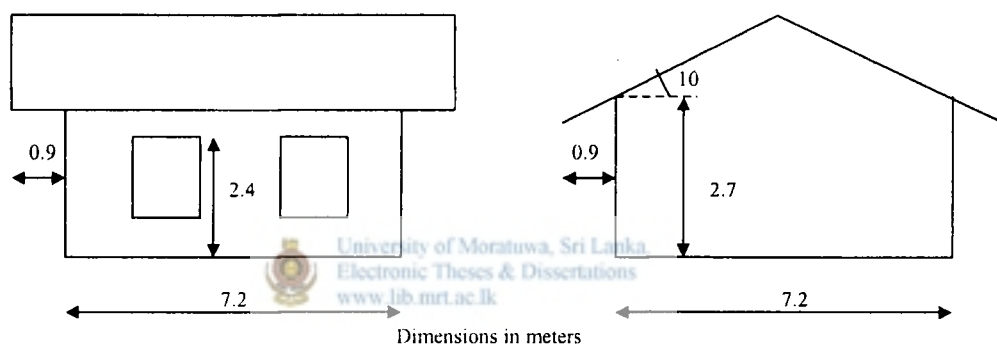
Front and side elevation of model house with east-west ridge roof
